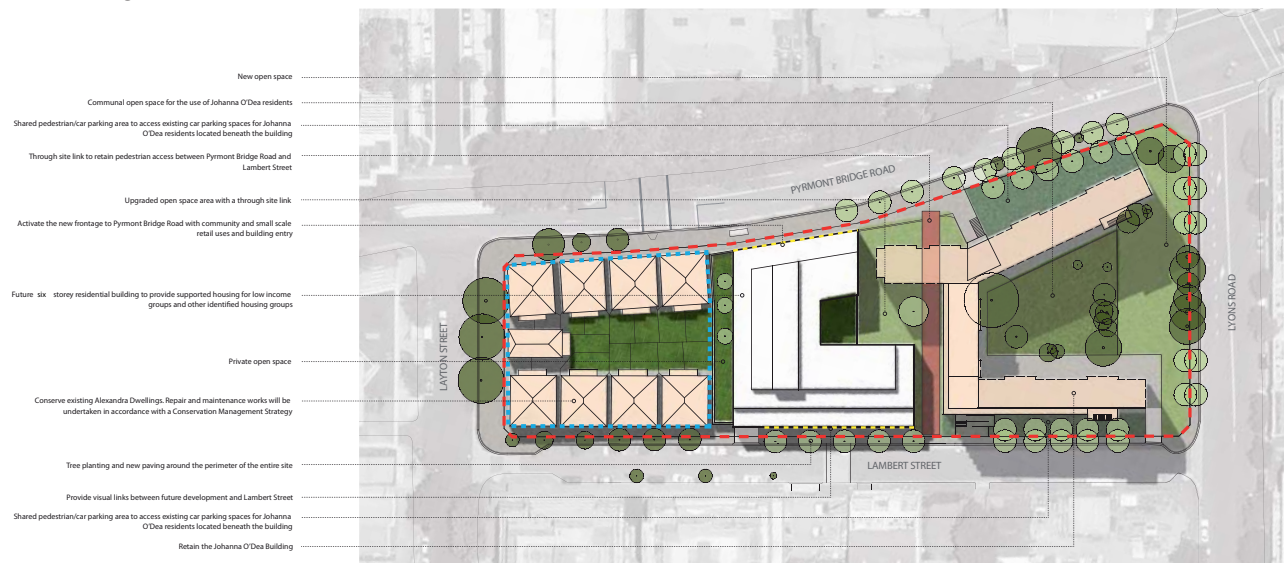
Concept Plan for 23-45 Pyrmont Bridge Road
